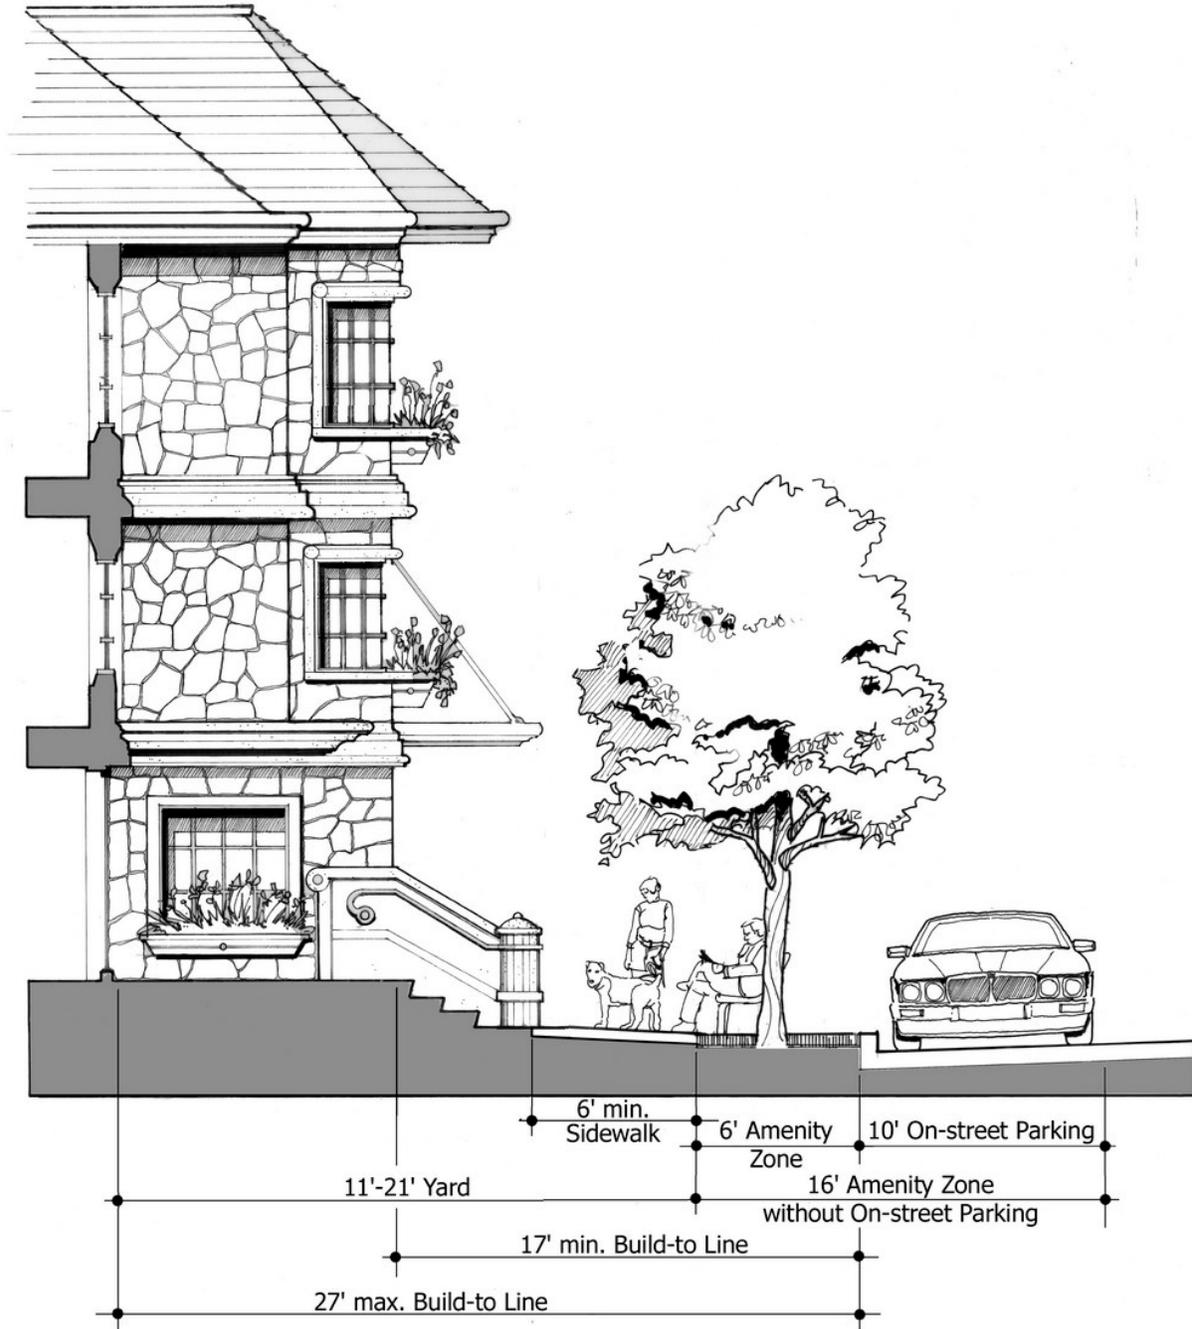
Street section, non-arterial streets (except Greenville Avenue)
